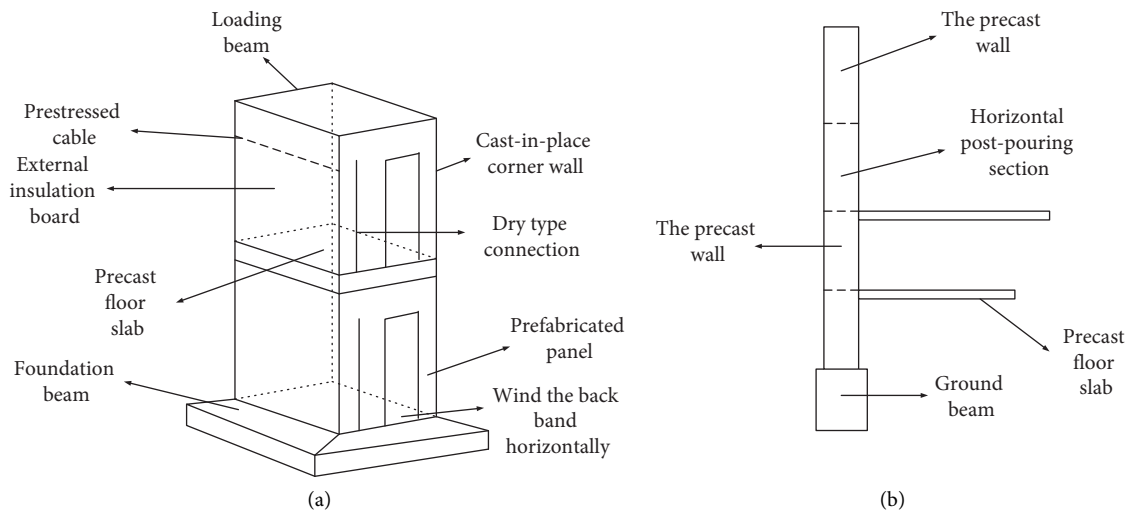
Shear wall structure: (a) fabricated shear wall integral structure and (b) shear wall joint.
